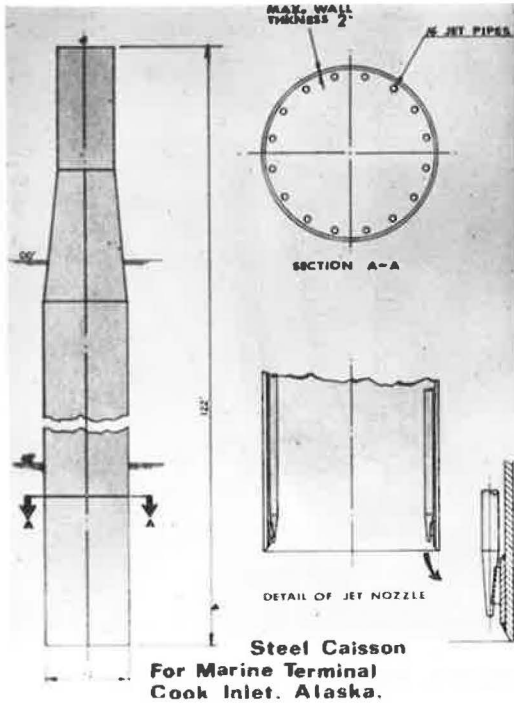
Steel caisson pile used in Cook Inlet, Alaska, to withstand vertical and horizontal loads.
